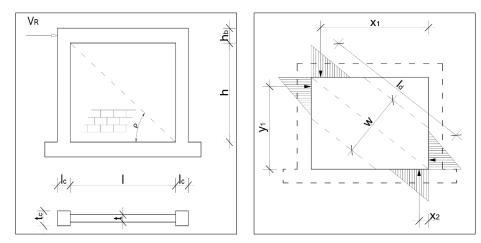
(a) RC frame with a masonry infill wall scheme; (b) idealised compressive stresses in the wall corners (ends of the diagonal strut) [56]
